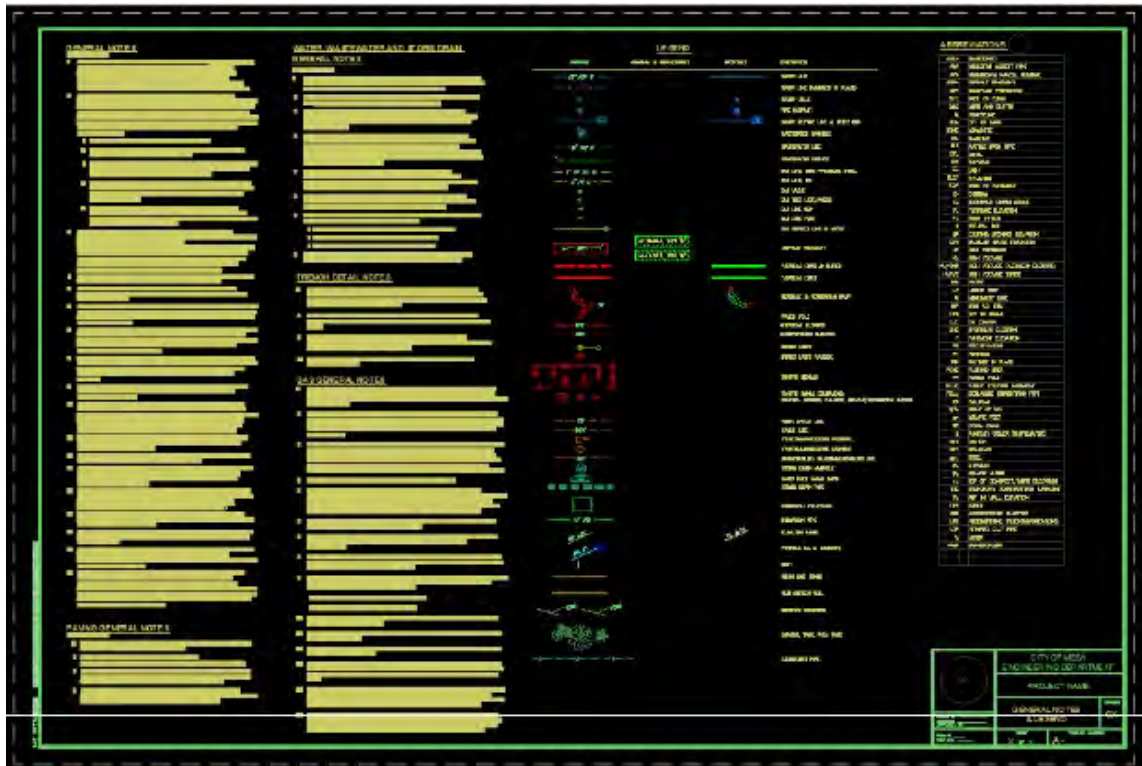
Typical Example of General Notes and Legend Sheet
